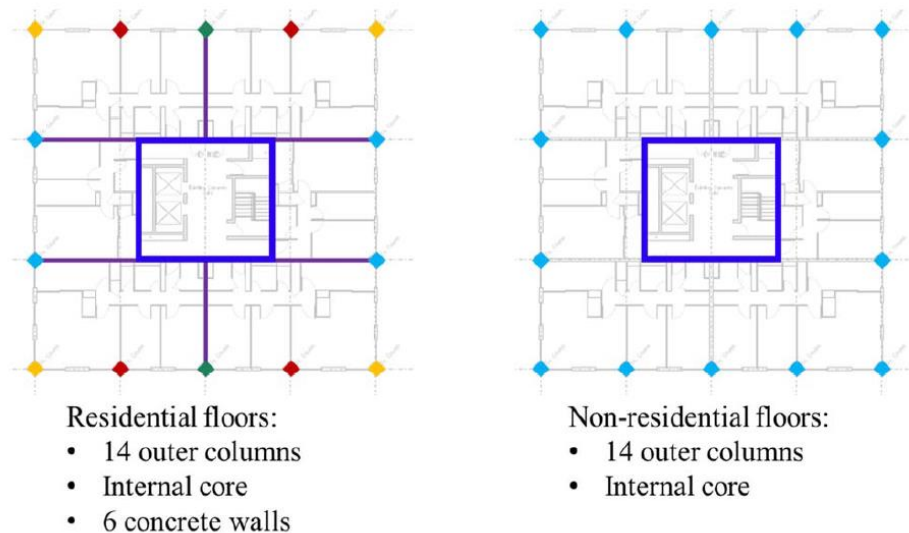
Floor plan layouts showing the structural supports (walls and “diamond shape” columns)
